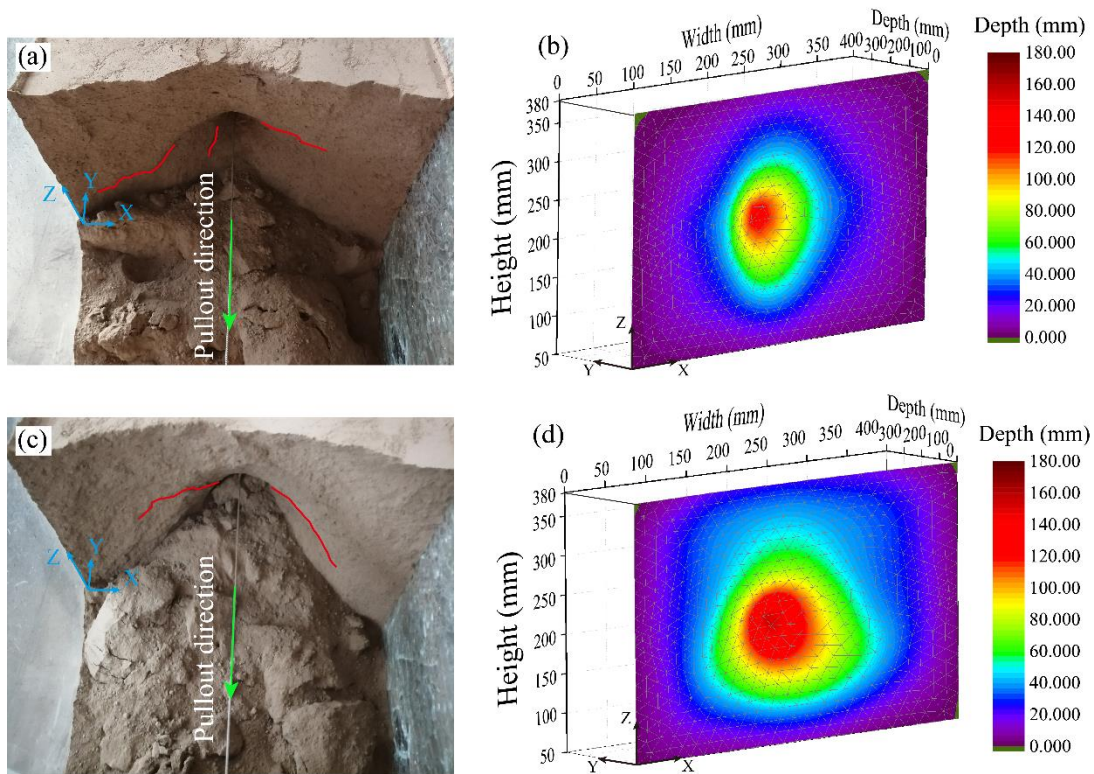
Soil final failure surface under the pullout force of the single cable: (a) Photo of the soil final failure surface ($D=7$ mm); (b) Three-dimensional contour of the soil final failure surface ($D=7$ mm); (c) Photo of the soil final failure surface ($D=10$ mm); (d) Three-dimensional contour of the soil final failure surface ($D=10$ mm).
